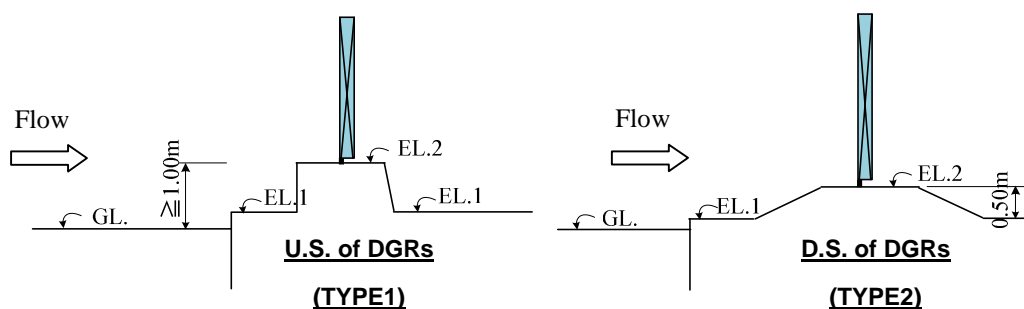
Schematic drawing for the elevation of apron around gate sill
